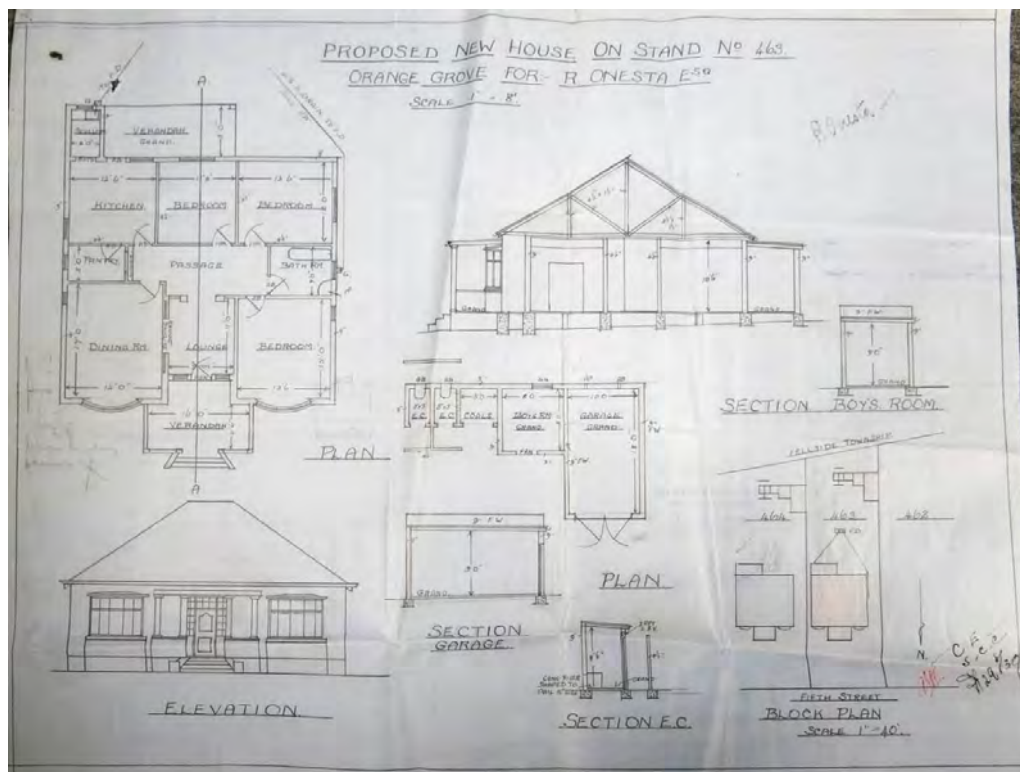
Plan for proposed new house on Stand 463, Orange Grove from 1930
